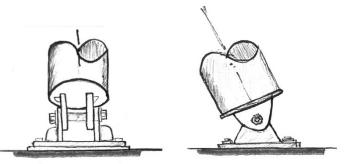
, Schematic sketches of detailing, Detail 1,2,3
